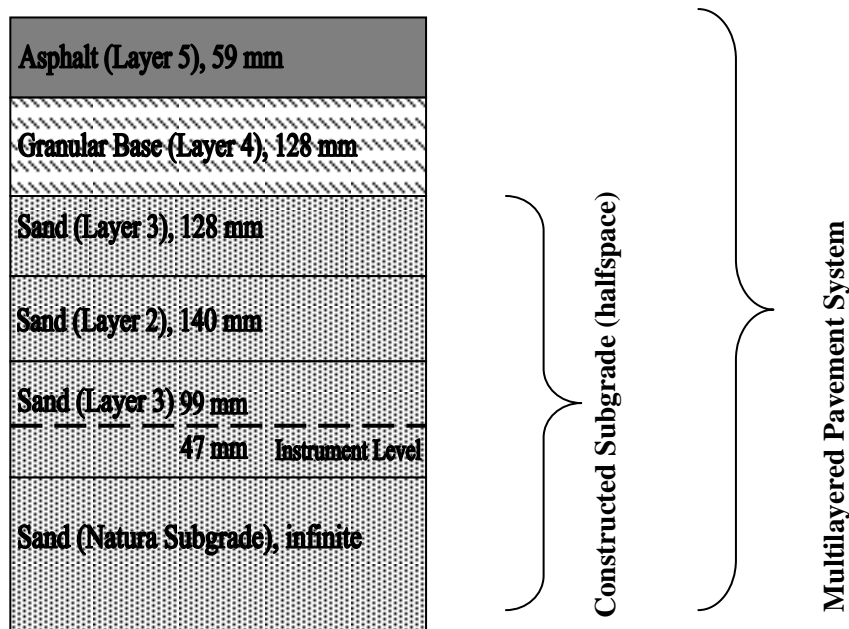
Pavement structure at the test site in Denmark (Hildebrand 2003)
